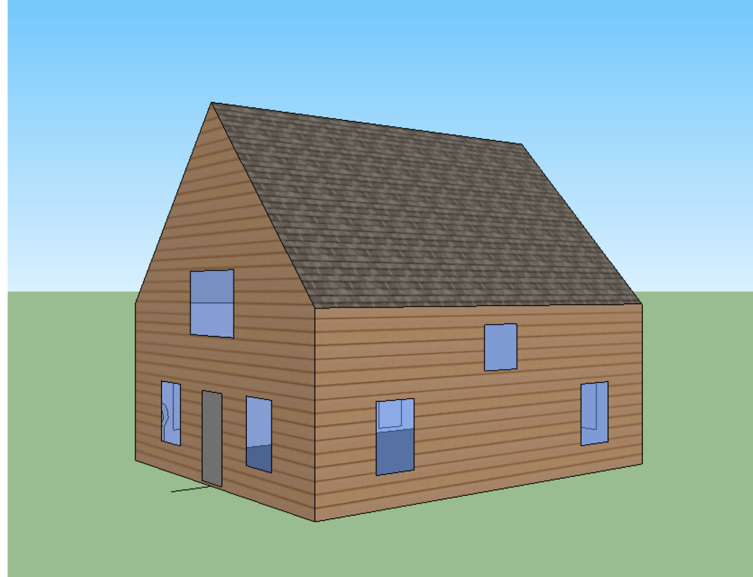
Sketch of Toronto house as seen from south-west corner
